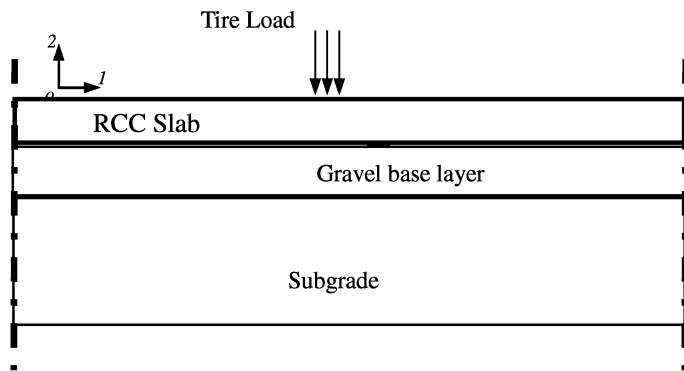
2D Model Adopted for a RCC Pavement under a Tire Load.
